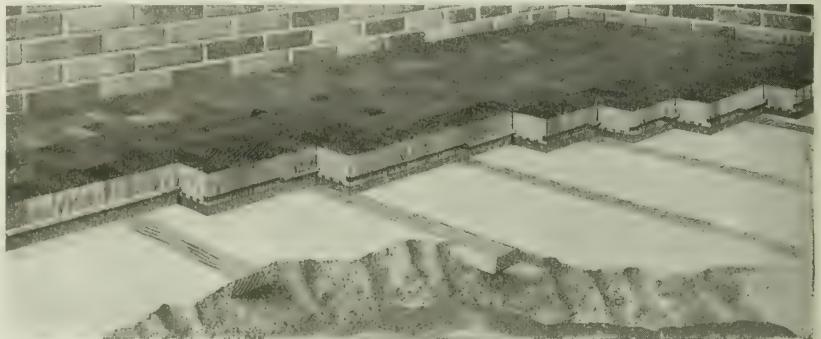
SHOWING INSTALLATION OF "BLOXONEND" OVER BEVELED SCREEDS EMBEDDED IN CONCRETE
